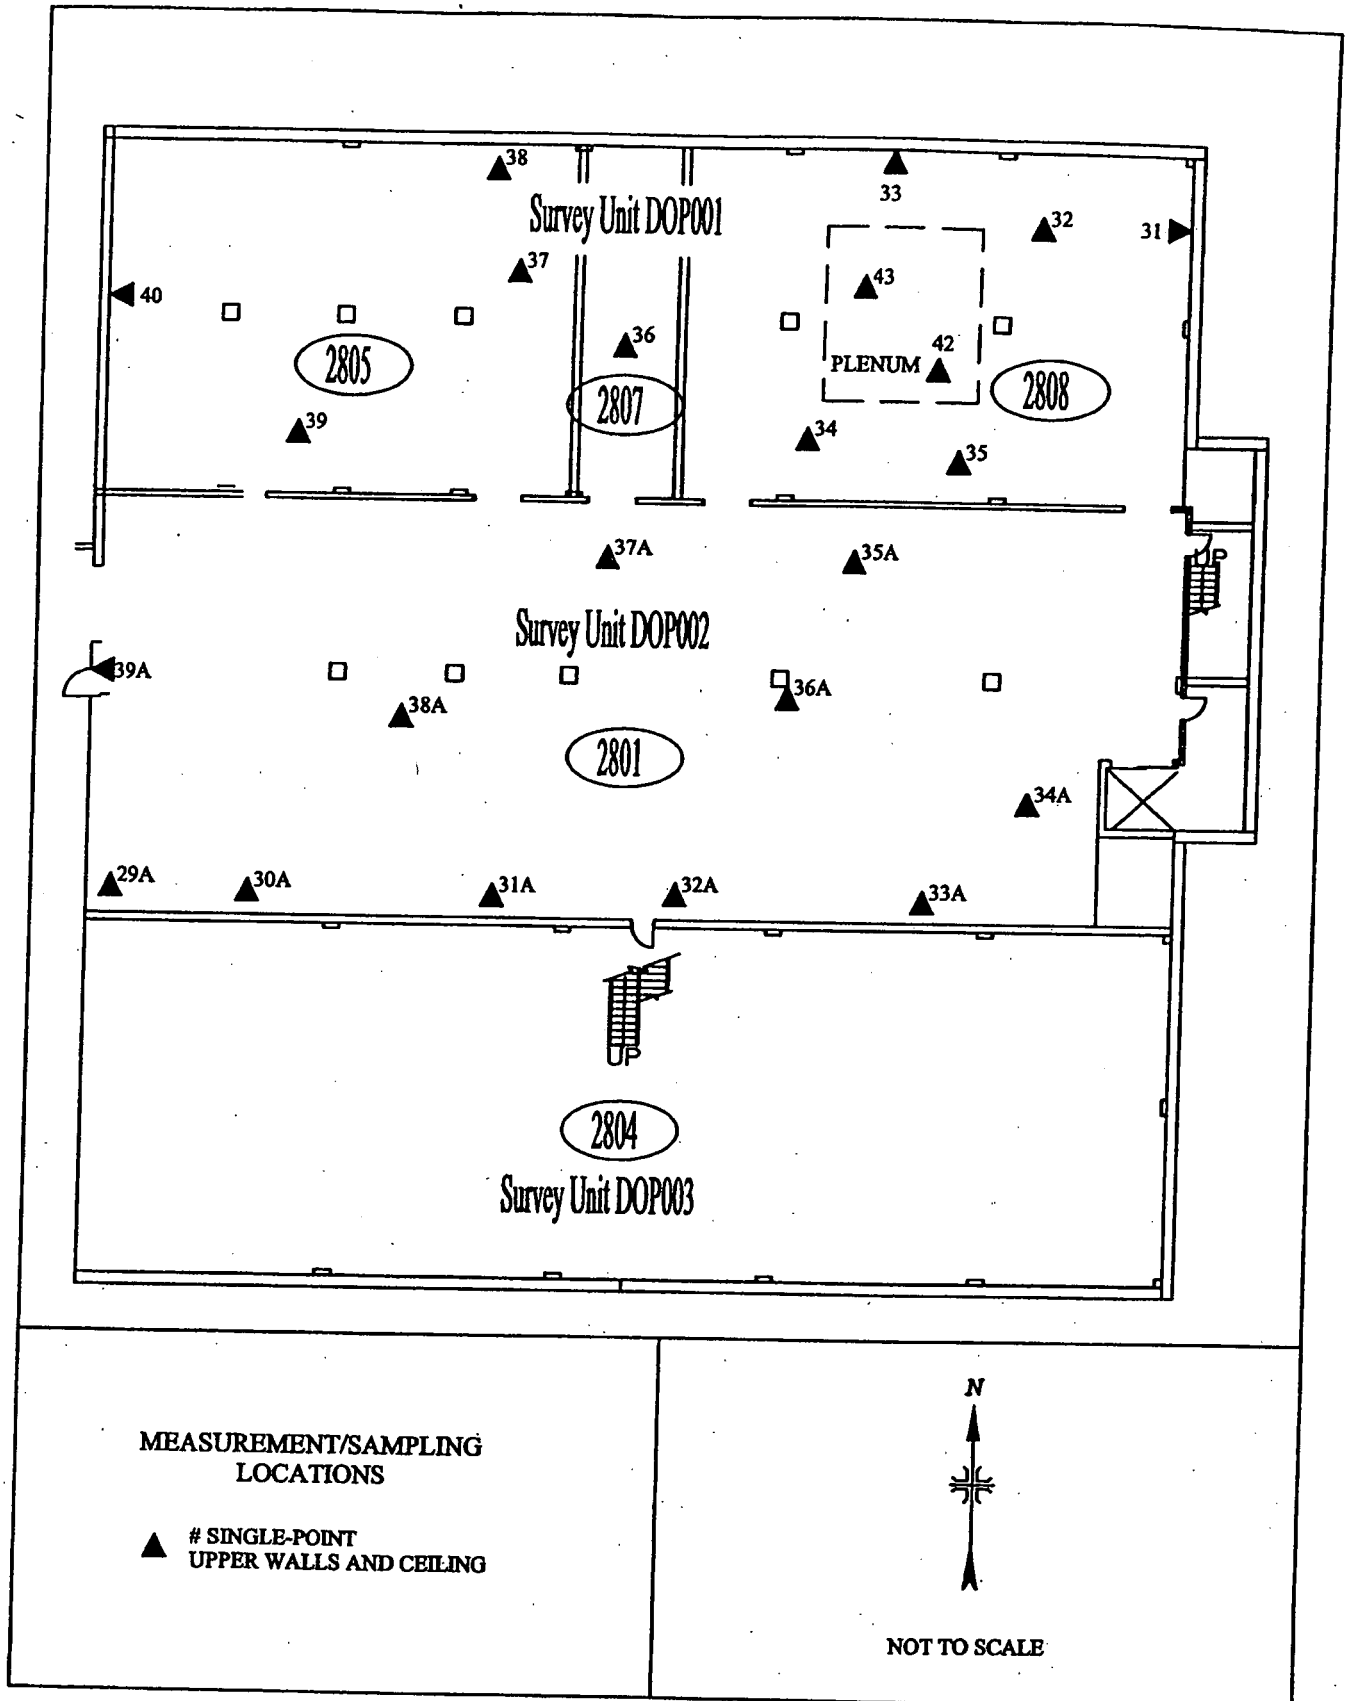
DOP Area Upper Walls and Ceiling - Measurement and Sampling Locations
